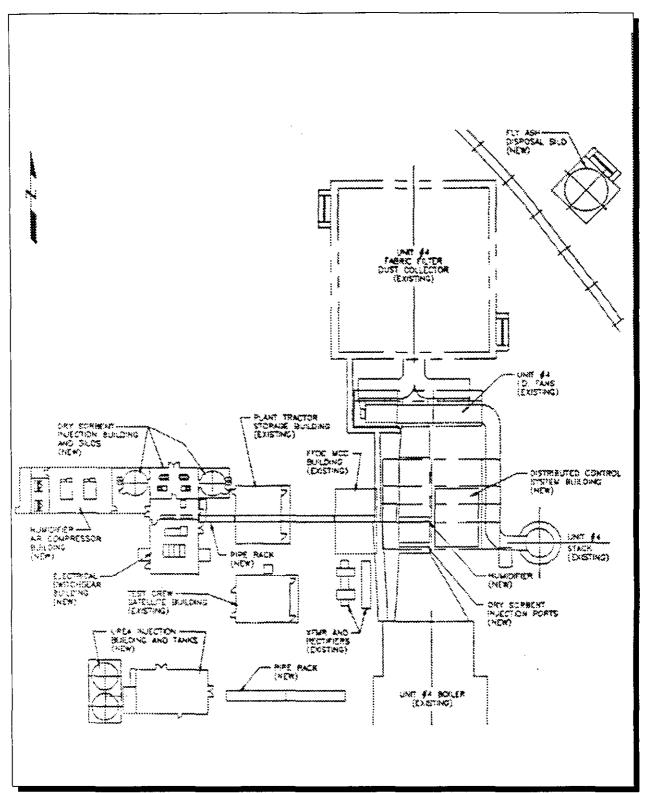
Plot Plan and Layout of Arapahoe Unit 4
